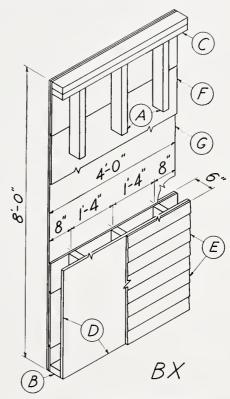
Four-foot wall specimen BX. A, stud; B, floor plate; C, top plate; D, insulating-board sheathing; E bevel siding; F, insulating-hoard lath; and G, plaster.
